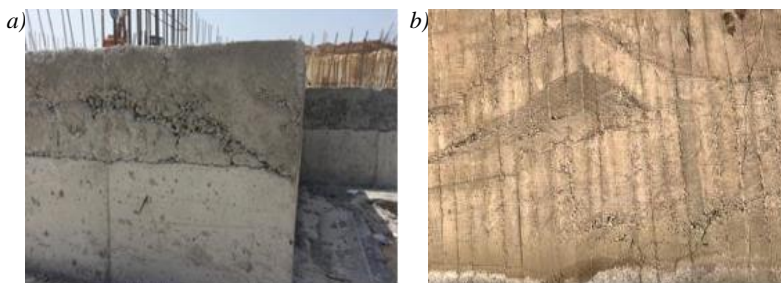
Oblique concrete layer, defective cold joint: *a* – cold joint in foundation level; *b* – cold joint at the retaining wall
